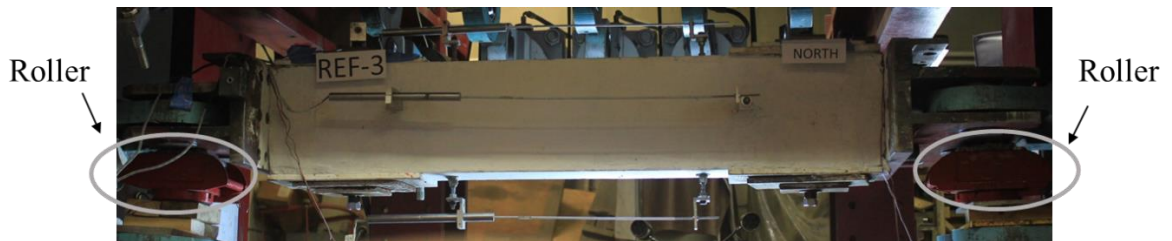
Typical Setup for Uniaxial Tension Test
